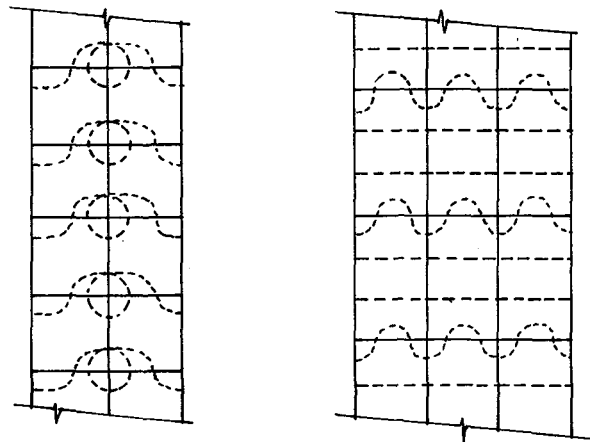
PLAN VIEW OF BIAXIAL COMPRESSION JOINING OF PANELS BY PRESTRESSING TENDONS RUNNING THROUGH CONDUITS
